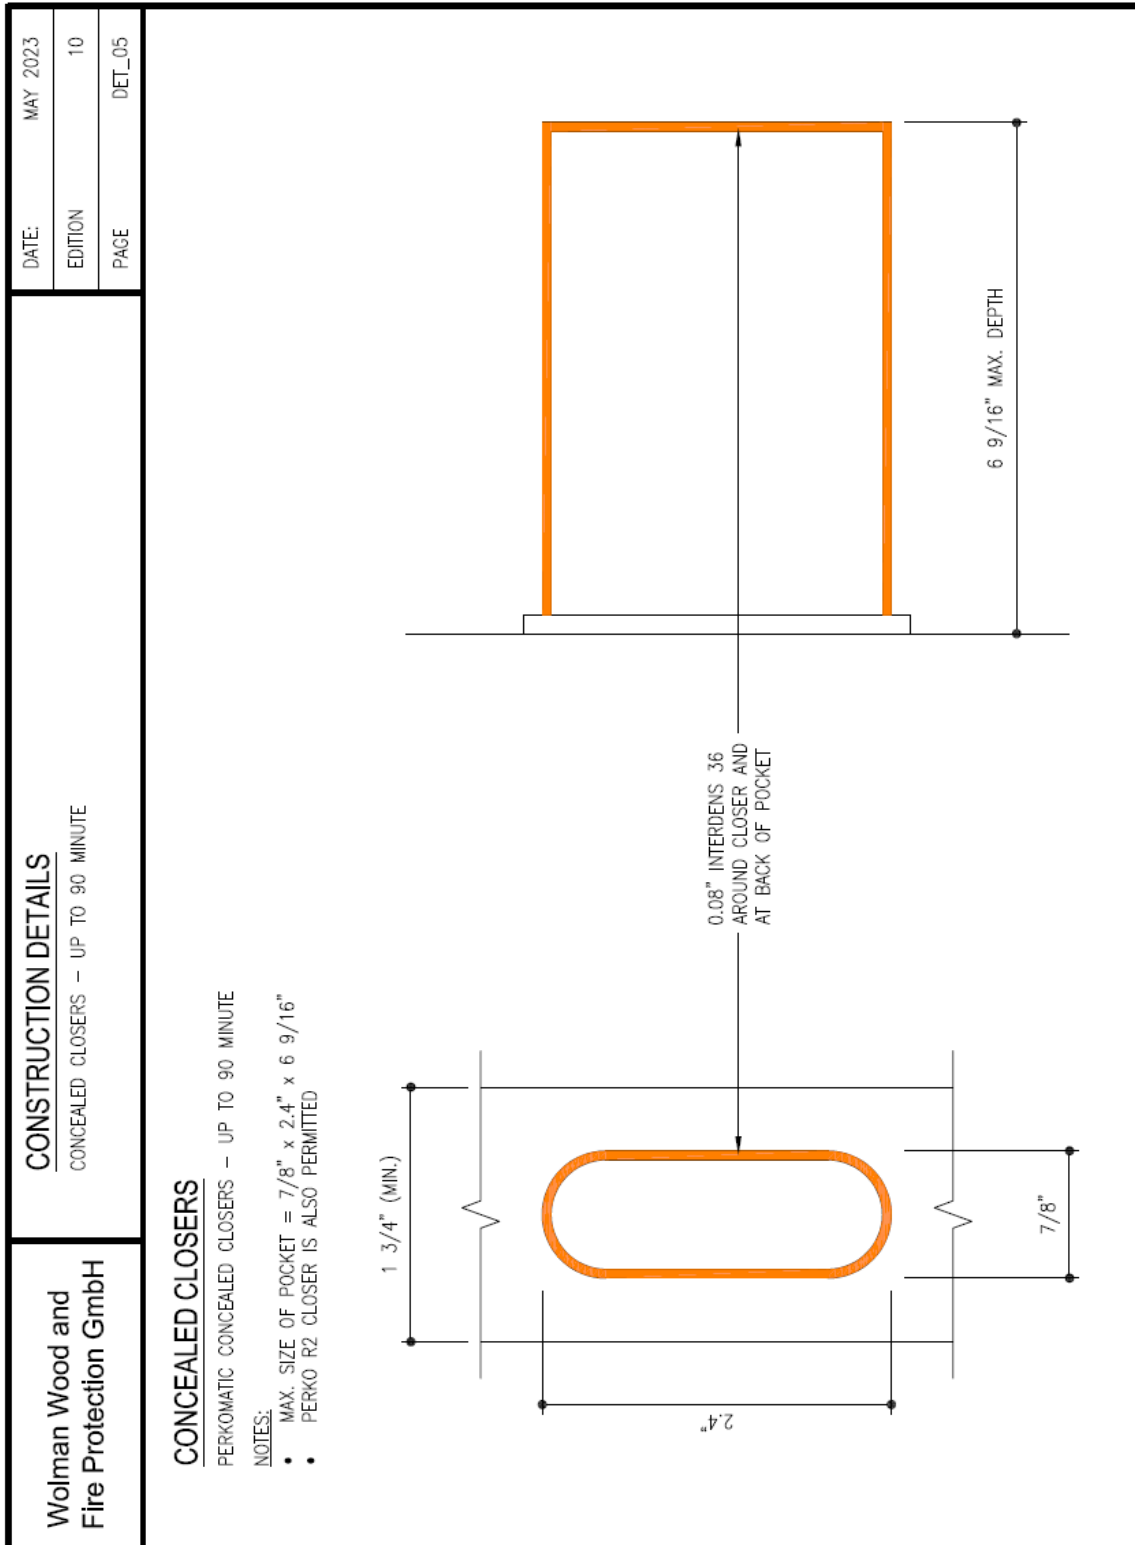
20-90 minute rated door assembly – Door Edge concealed closer detail.
